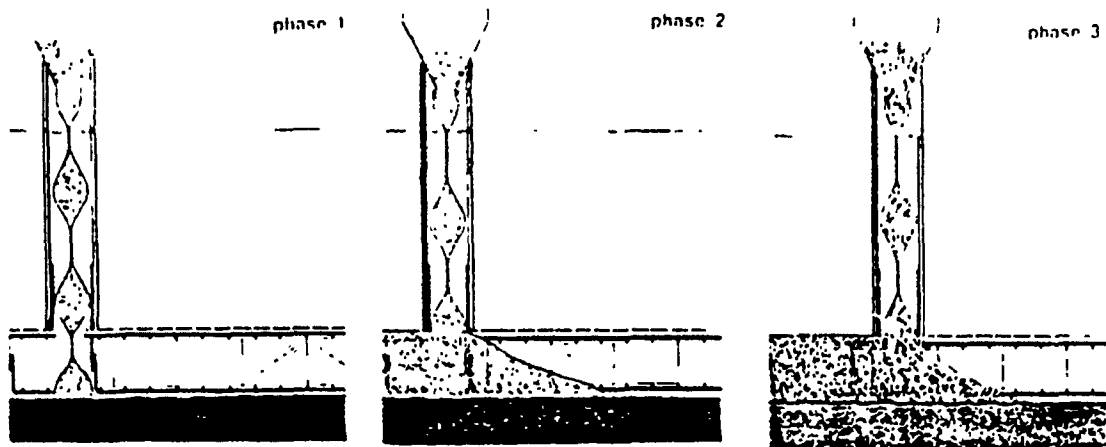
Underwater Placement with a Hydro-valve Tremie Pipe
